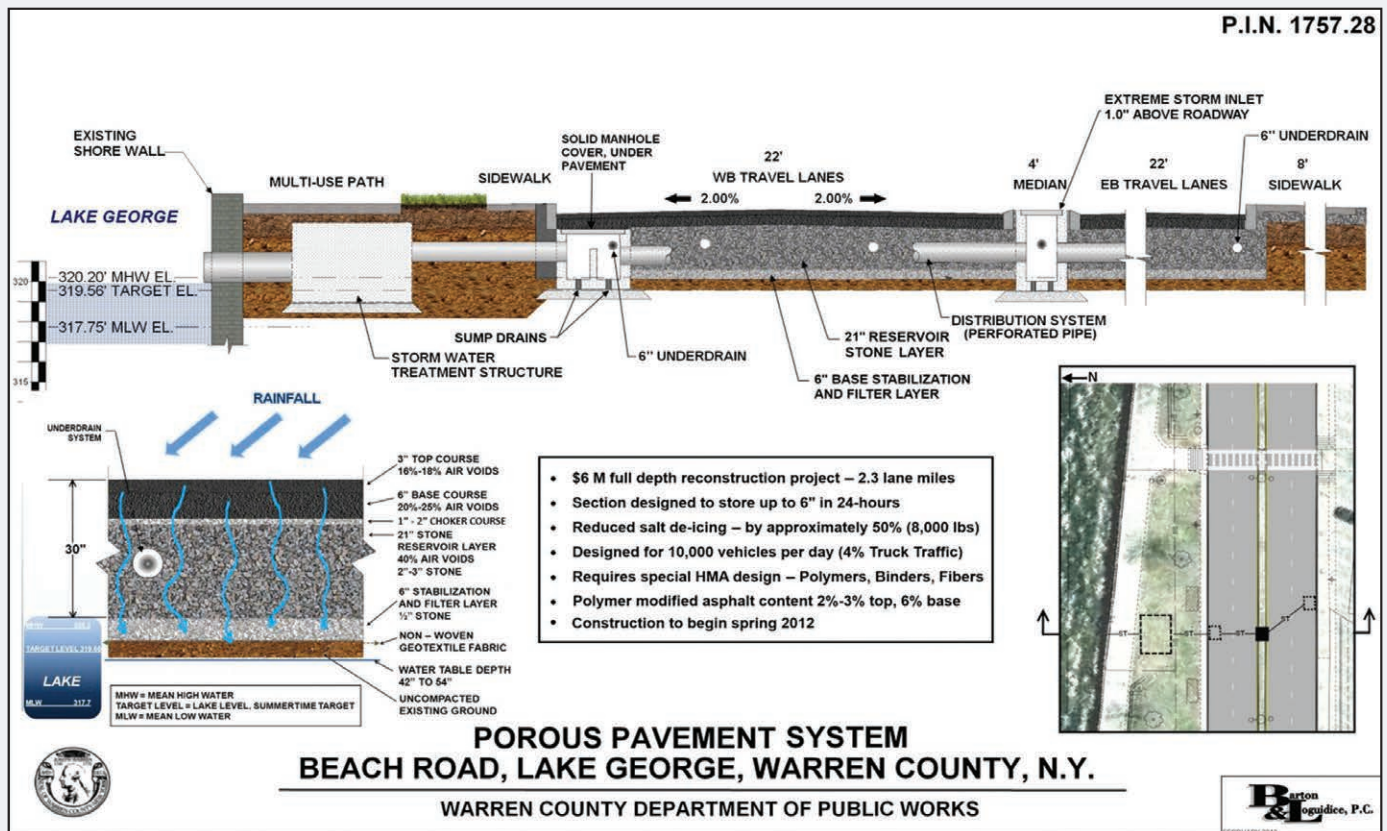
CS-1-2. Cross-section of the heavy duty permeable asphalt road design used for Beach Road.
